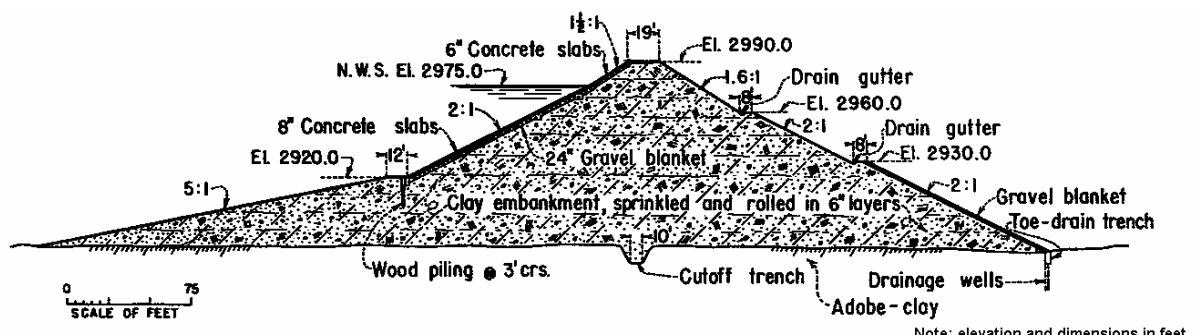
Belle Fourche dam; main section as constructed in 1911 (courtesy of U.S. Bureau of Reclamation).
